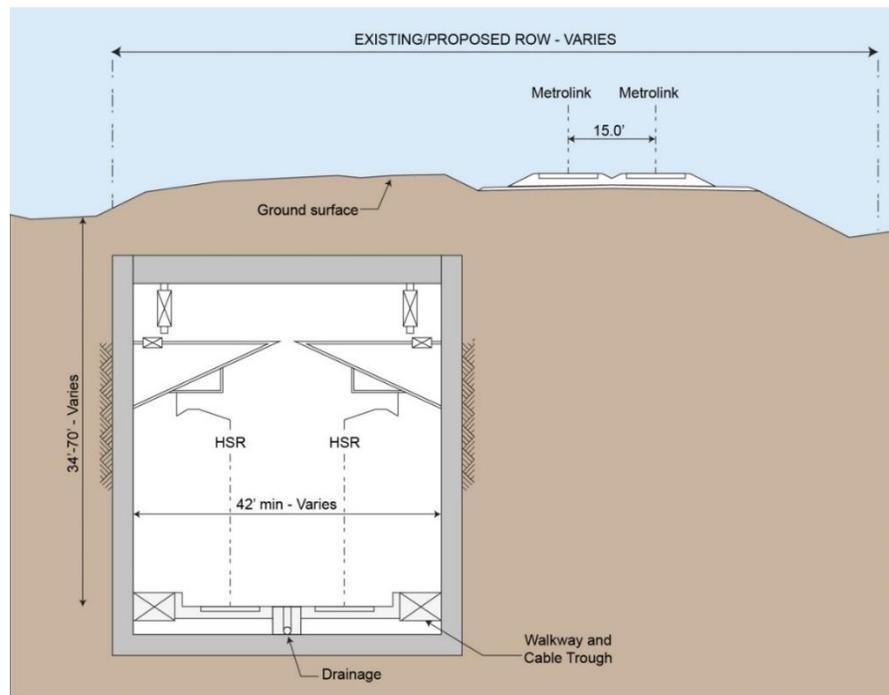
Cut-and-Cover Tunnel Typical Cross-Section
